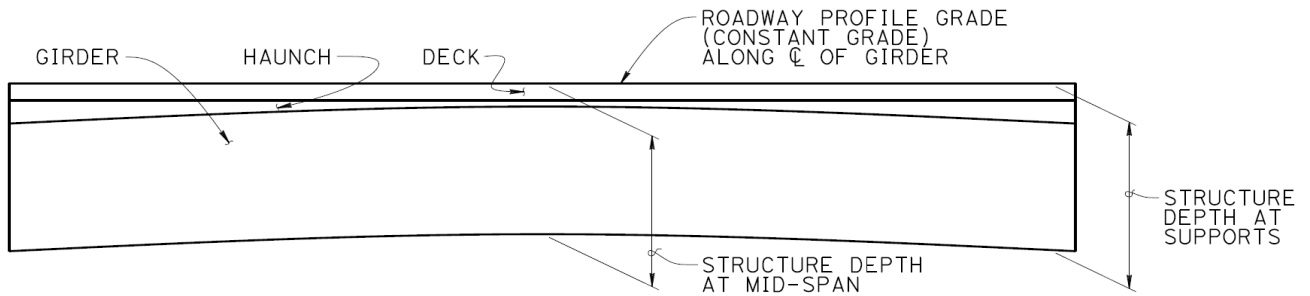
Elevation Showing Possible Haunch and Structure Depth Variation for Roadway Profile with Constant Grade
